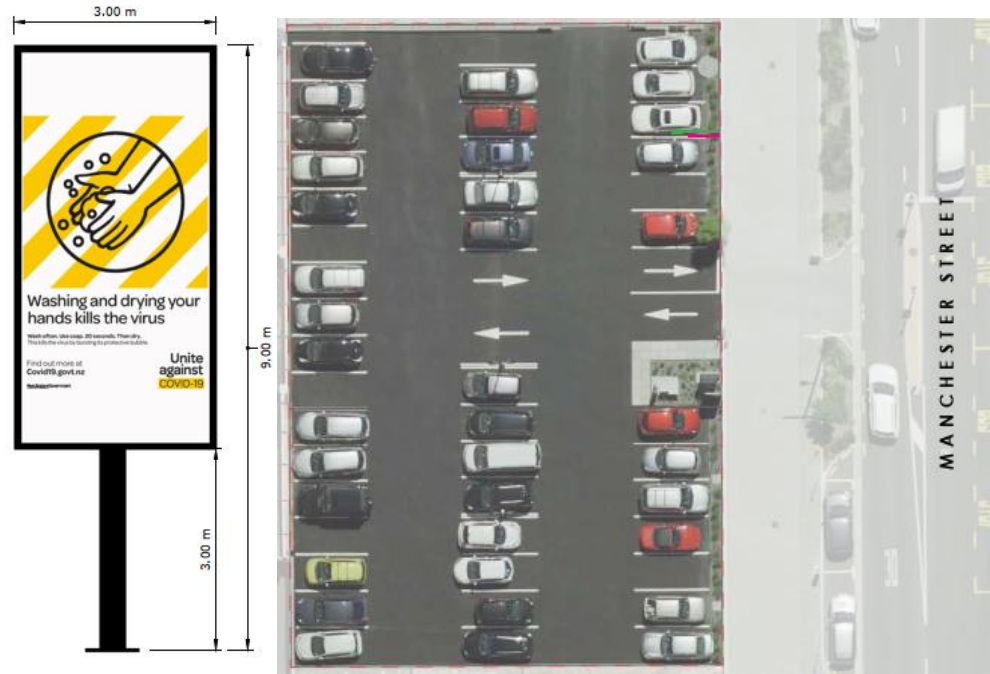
An elevation of the proposed billboard. Location of the proposed billboard at 235 Manchester indicated by green line on the plan view image. (Source: DCM Graphic Attachment)
